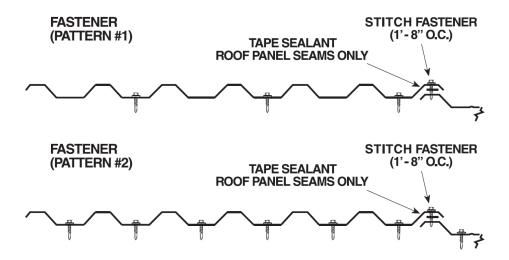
TYPICAL FRAMING AND STITCH FASTENER PATTERNS
